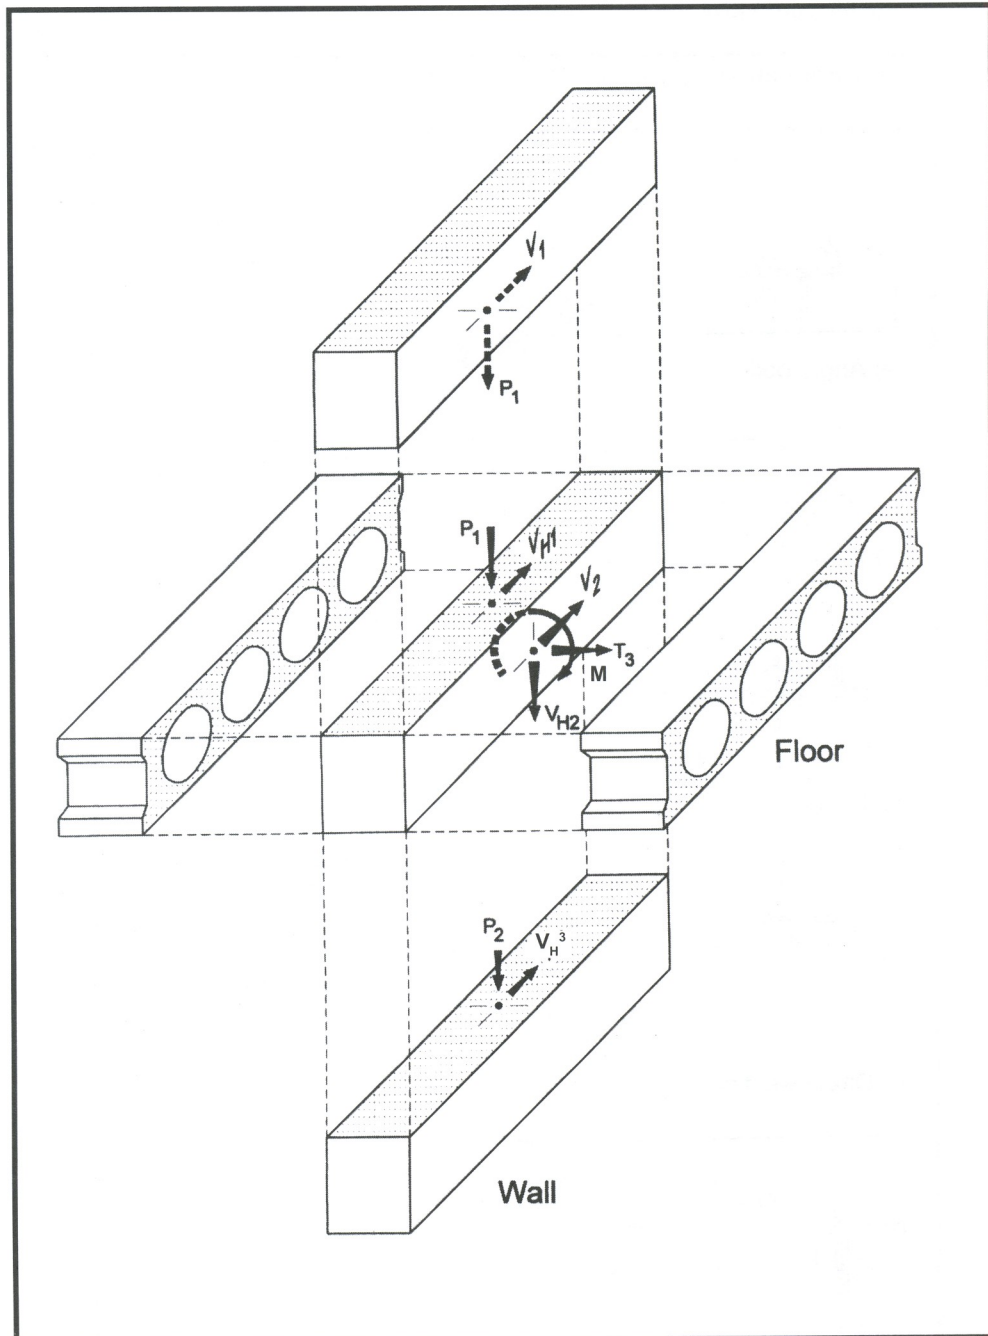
Exploded View Of An Interior Floor To Wall Connection And The Various Connection Forces (references 5 and 9)
